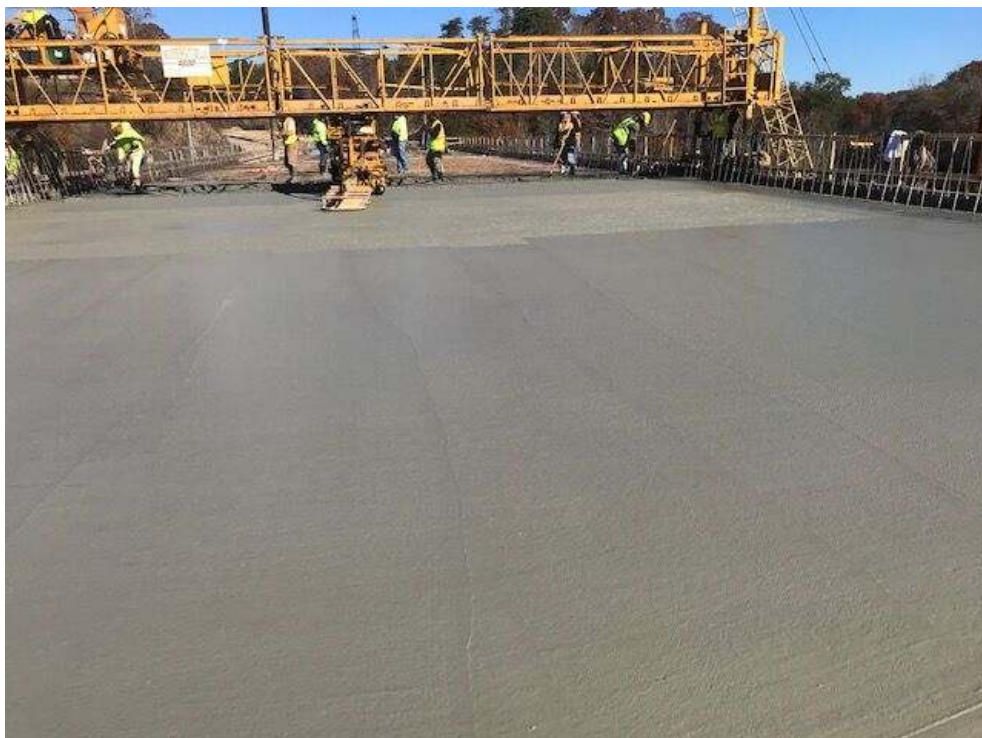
Bridge over Little River showing freshly lain concrete bridge decking
